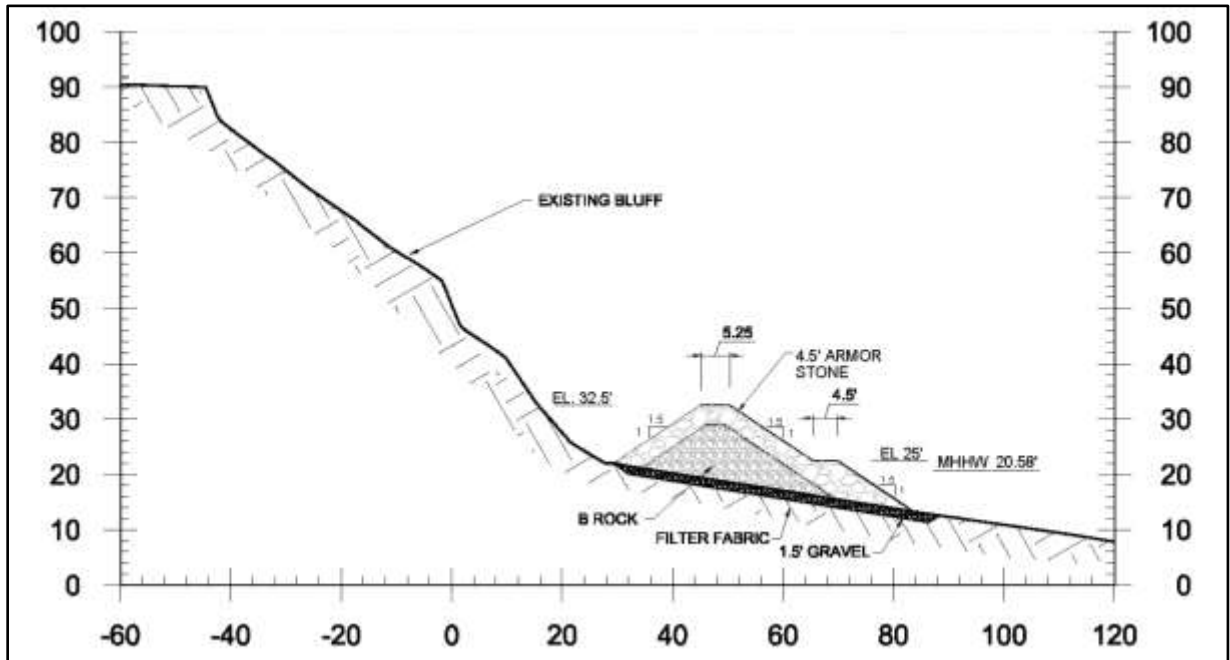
Alternative 5 Typical Section Berm at Bluff Toe
